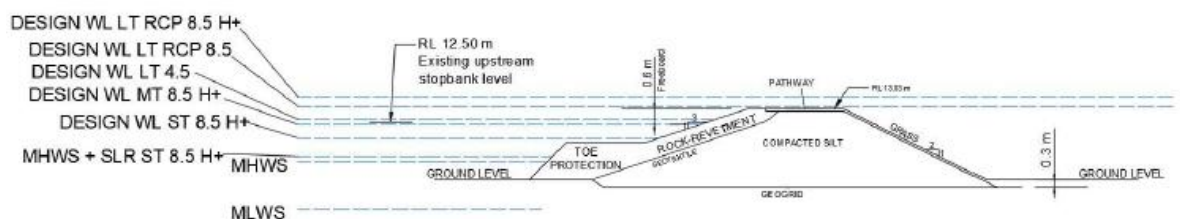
Typical stop bank cross section (Beya and Asmat 2020).
